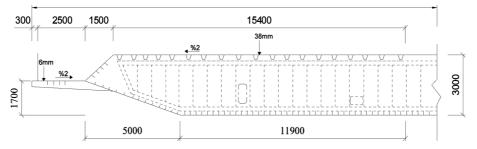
Dimensions of aerodynamic steel box girder deck (dimensions as mm)
